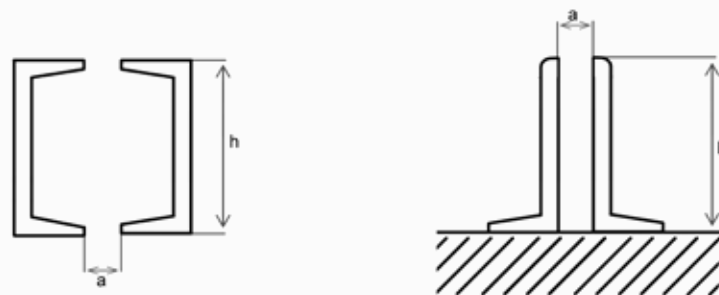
Minimum dimensions at tight distances between surfaces (see DIN EN ISO 12944-3)
